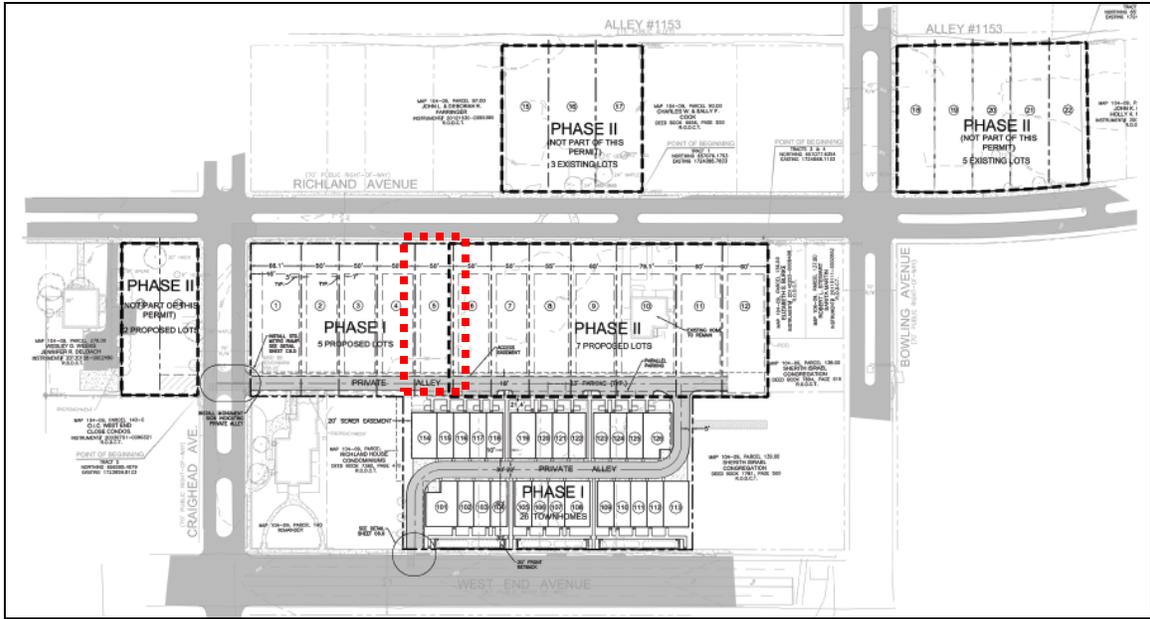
Overall site plan for the 22 infill houses planned for the Richland-West End Neighborhood Conservation Zoning Overlay. The red box indicates the site currently under consideration.
